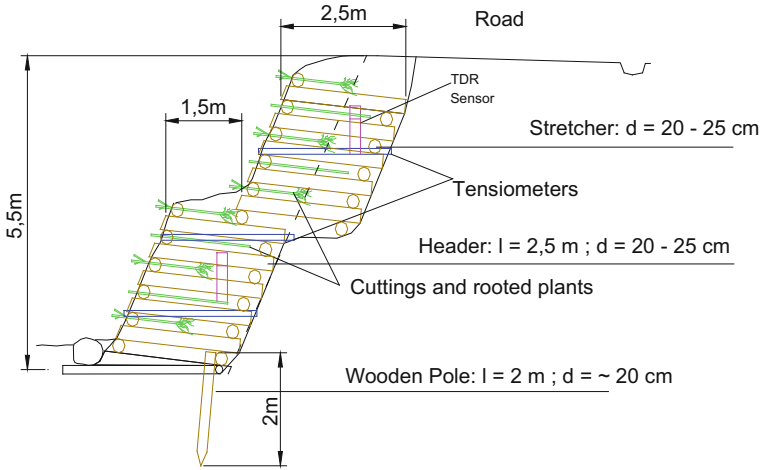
Arrangements for Tensiometers and TDR sensors in the slope supported by a vegetated wooden crib wall
